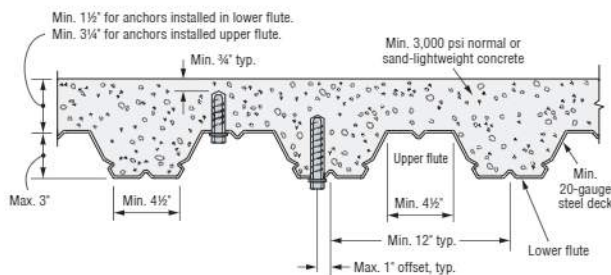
Installation of 3/8"- and 1/2"-Diameter Anchors in the Soffit of Concrete over Metal Deck
